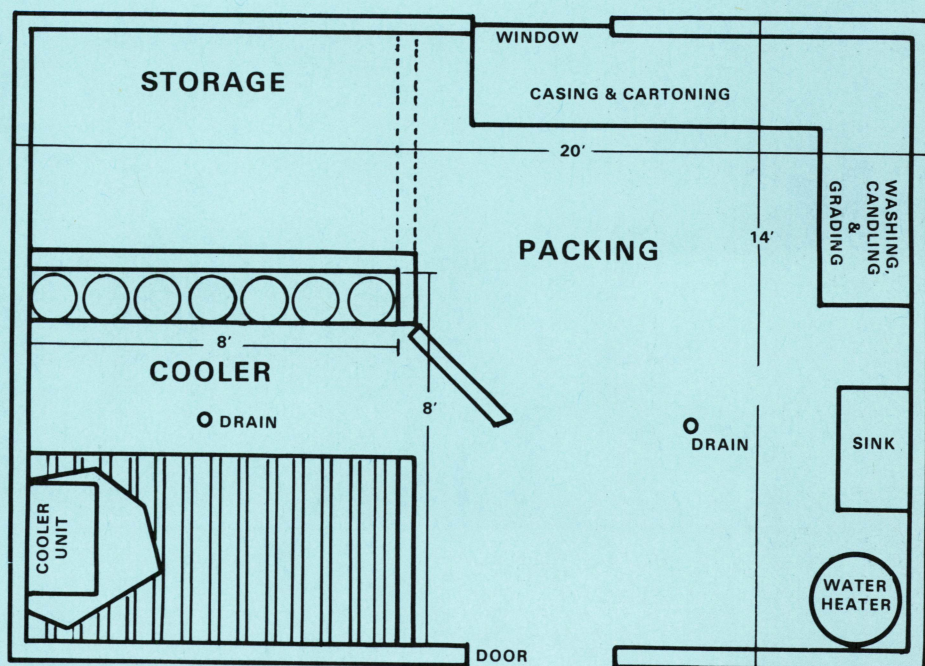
Suggested floor plan for egg-cooling room with adjacent packing room.
